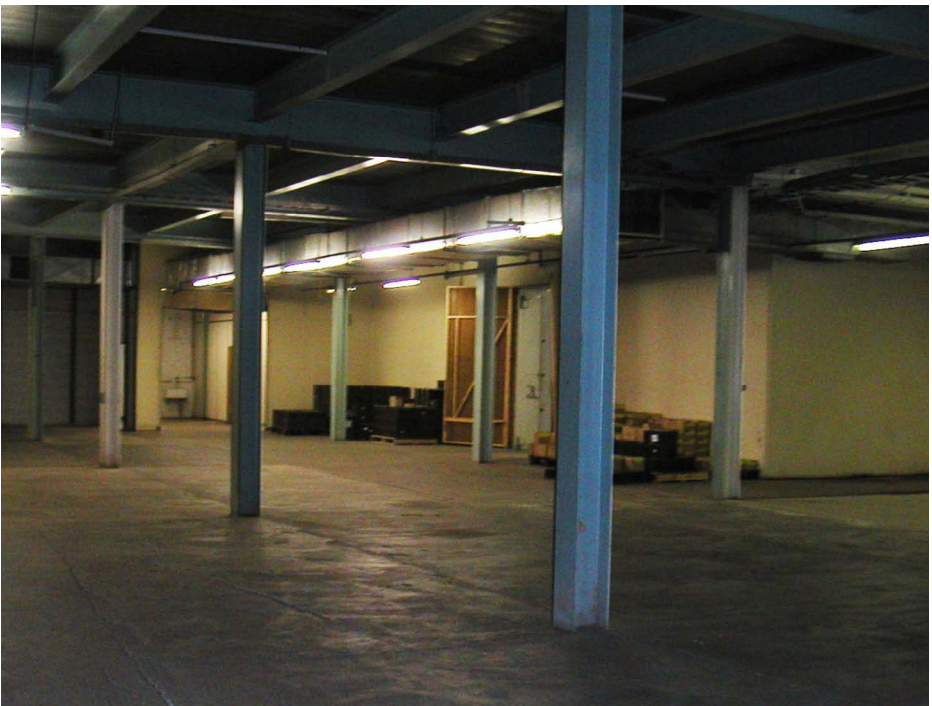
(b) The uranium processing area after the removal of the original concrete floor and partition walls with the vault in the background.
